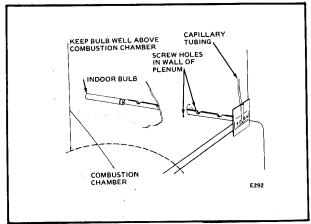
MOUNTING THE BULB HOLDER IN FUR-NACE PLENUM.
